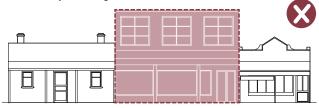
New building that does not respect the height, setbacks, external profile, facade pattern and materiality of adjoining contributory buildings.
